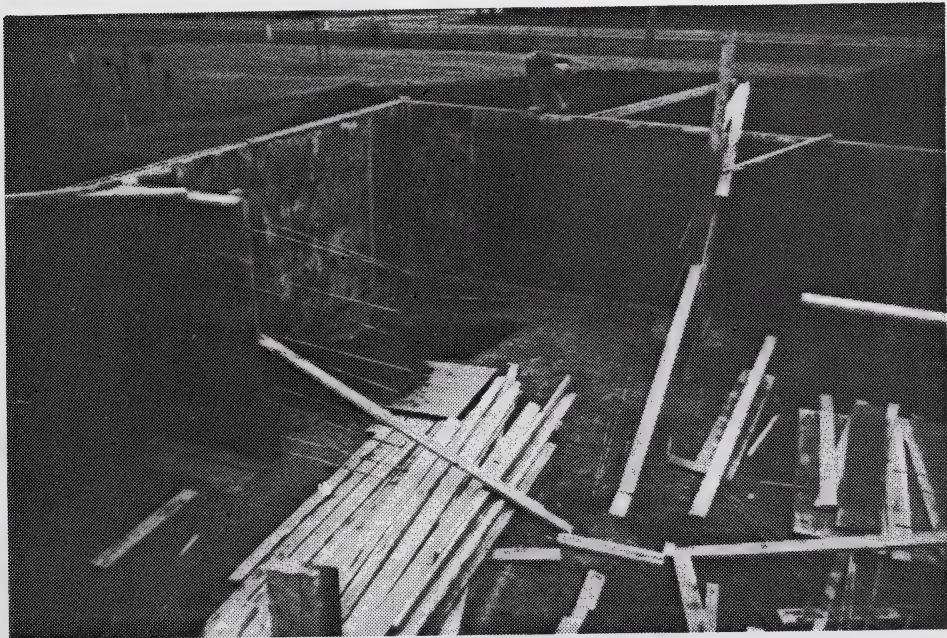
NORTHEAST VIEW OF FOUNDATION WALL FORMWORK
